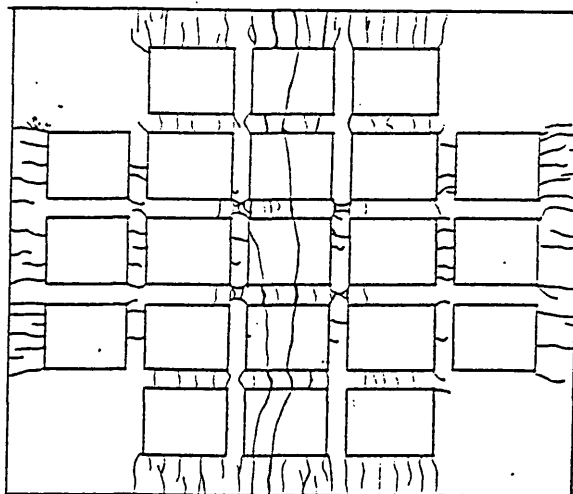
Failure Crack Pattern of R.C.Waffle Model Slab J1
